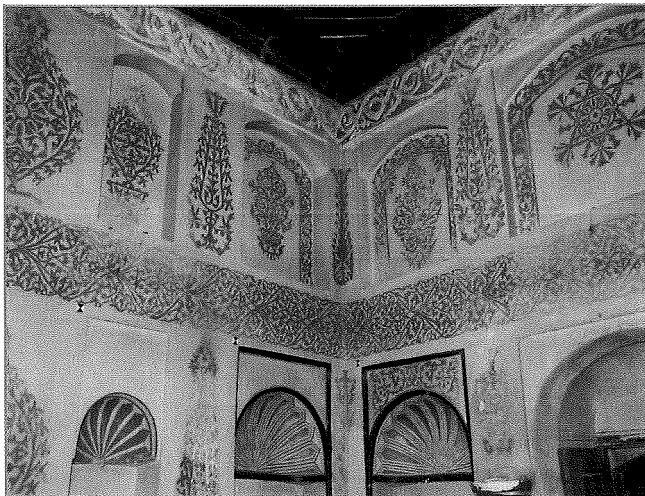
Damage caused by water seepage on the SW wall, adjacent to B1-1/3 building
